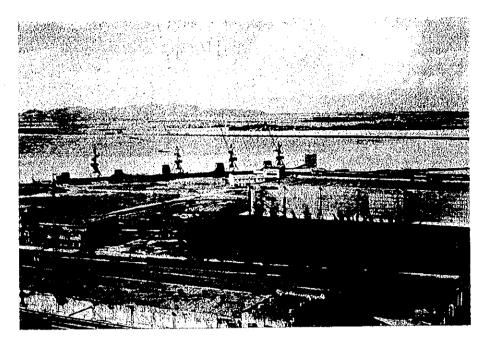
4 A View of Coal Unloading Port and Coal Strage Site
